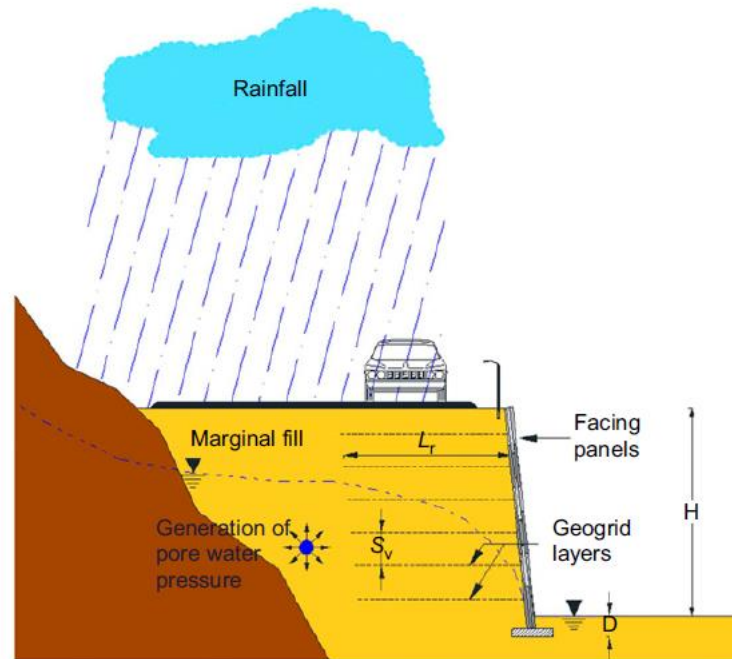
Schematic cross-section of geogrid reinforced soil wall with low permeable backfill subjected to seepage
